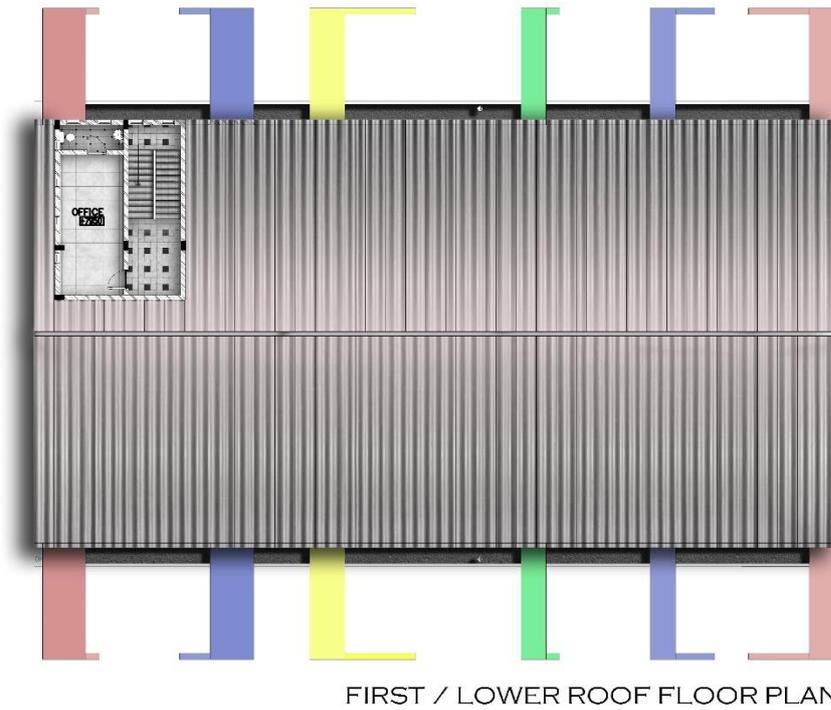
28: Ikeja bus terminal lower roof plan / first floor plan
